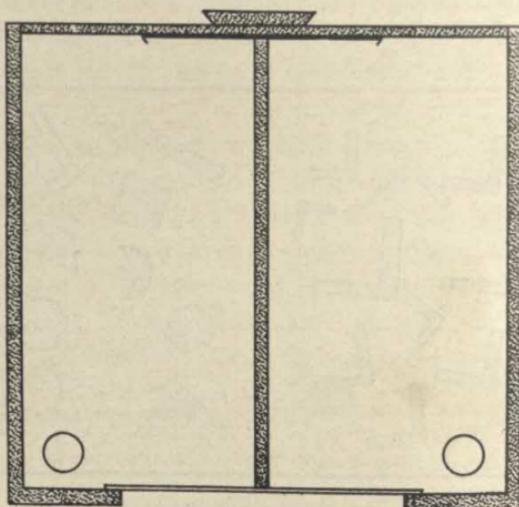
FLOOR PLAN OF EXPOSURE BOX
